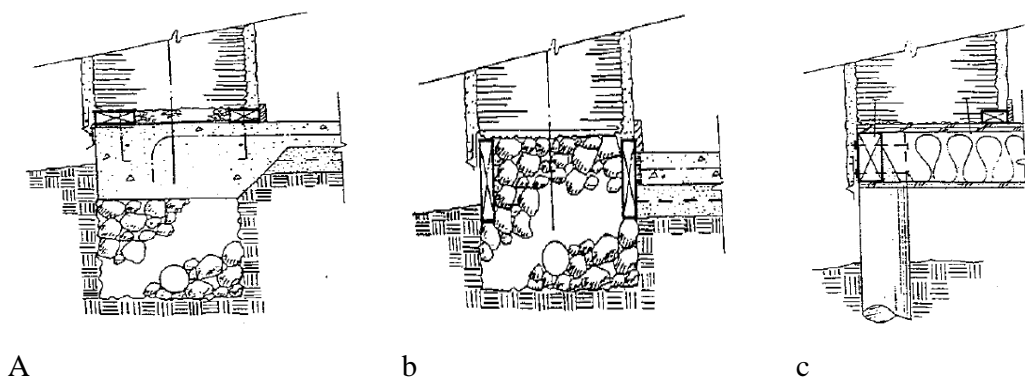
Types of foundation, (a) Rubble Trench, (b) Framed Box and (c) Raised floor
